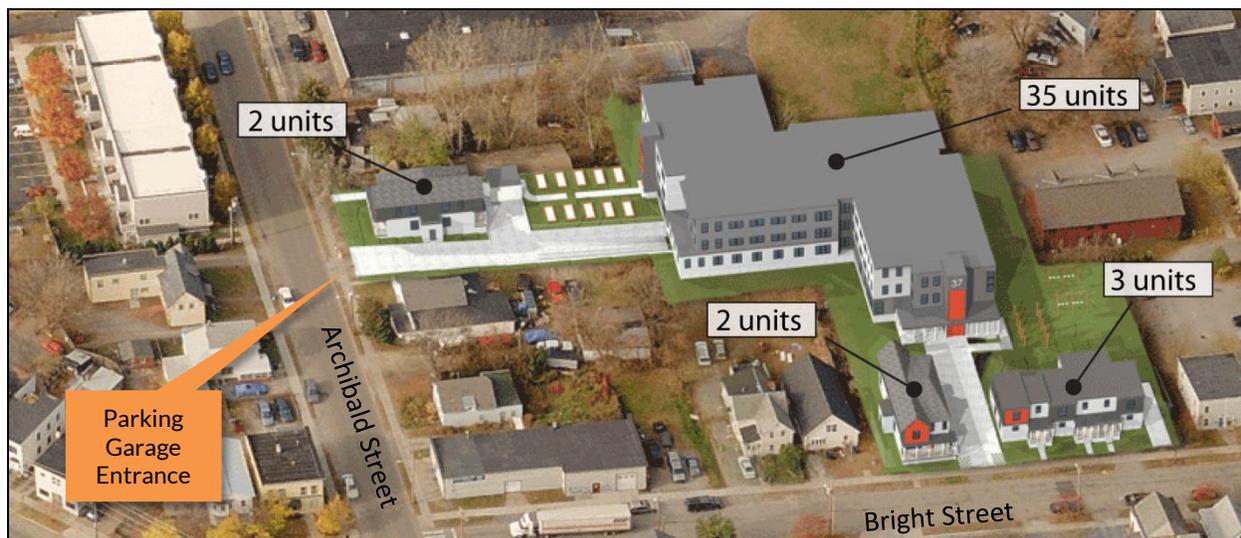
Rendering of Bright Street Co-op (Source: Champlain Housing Trust)
